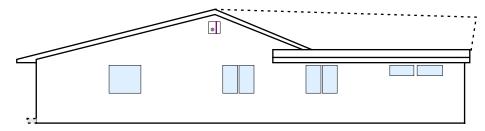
Elevation view existing house viewed from inside from east looking west. Southern most window (to the left in the diagram) is in the addition. New roof line (solid line) runs from the roof peak to the south. Old north roof line (dotted) is in the middle of the occupied (non-carport) north part of existing house.
